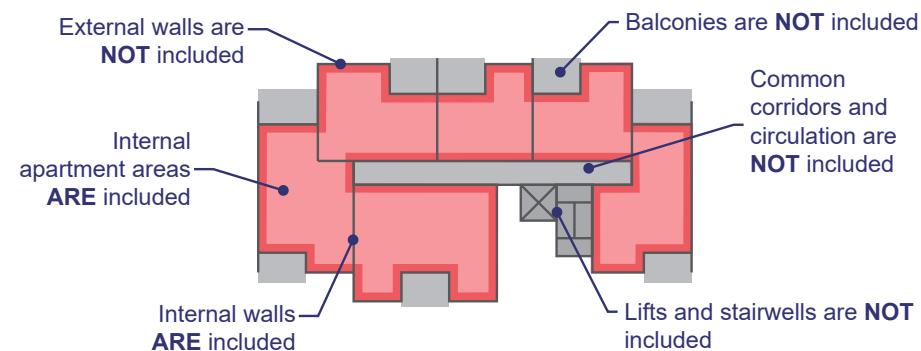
illustrates some aspects of a building footprint that contributes to the residential floor area.
